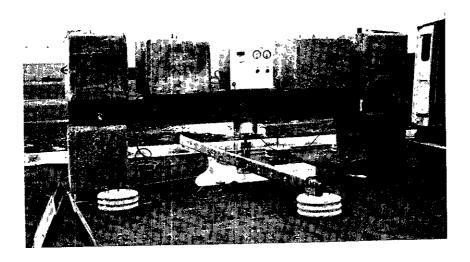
Photograph of field test installation for tests on asphalt concrete surfacing.
